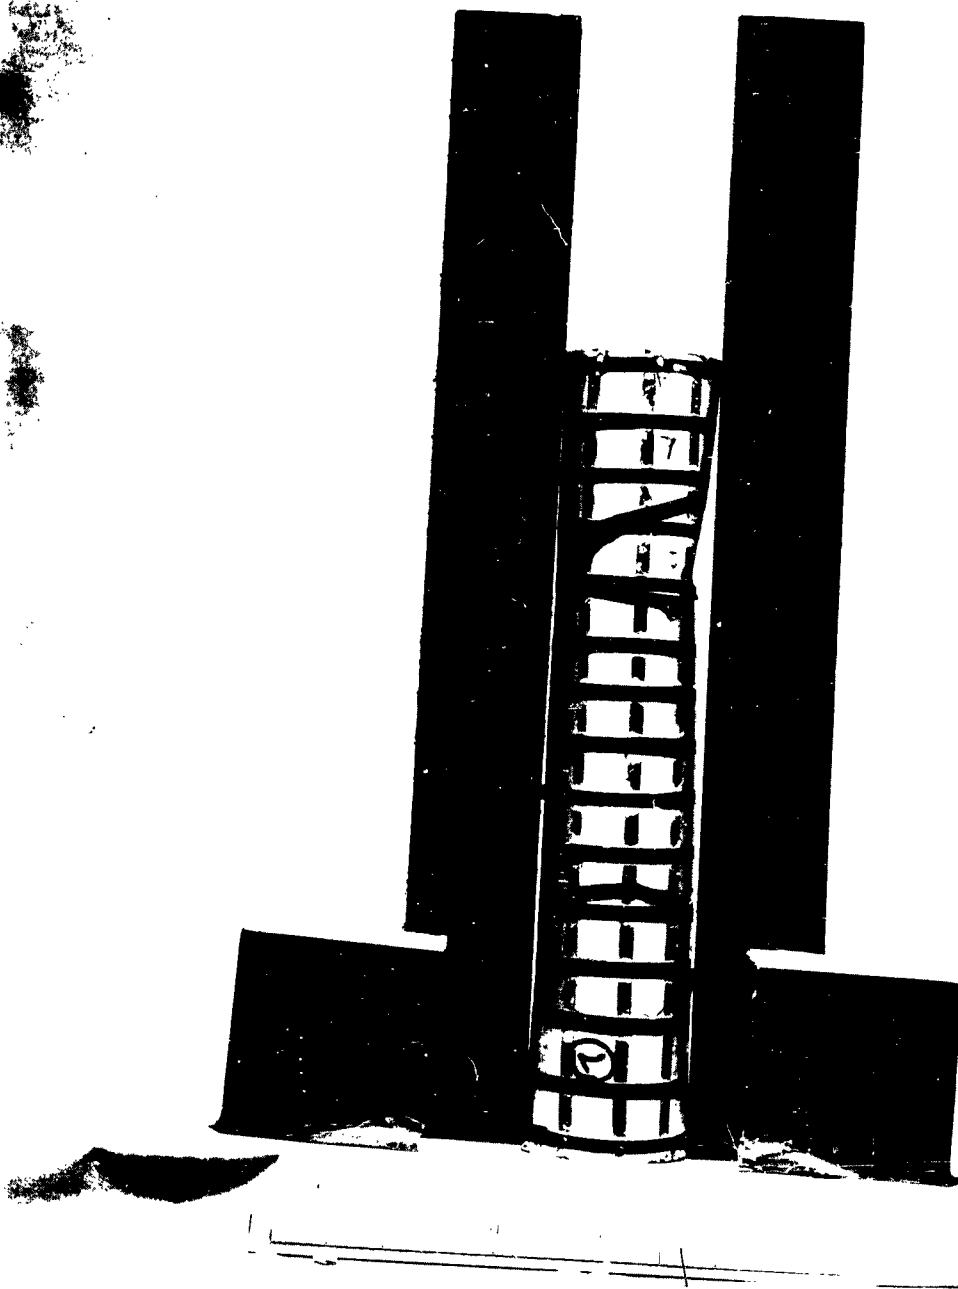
SHELL NO. 10 - SIDE VIEW
